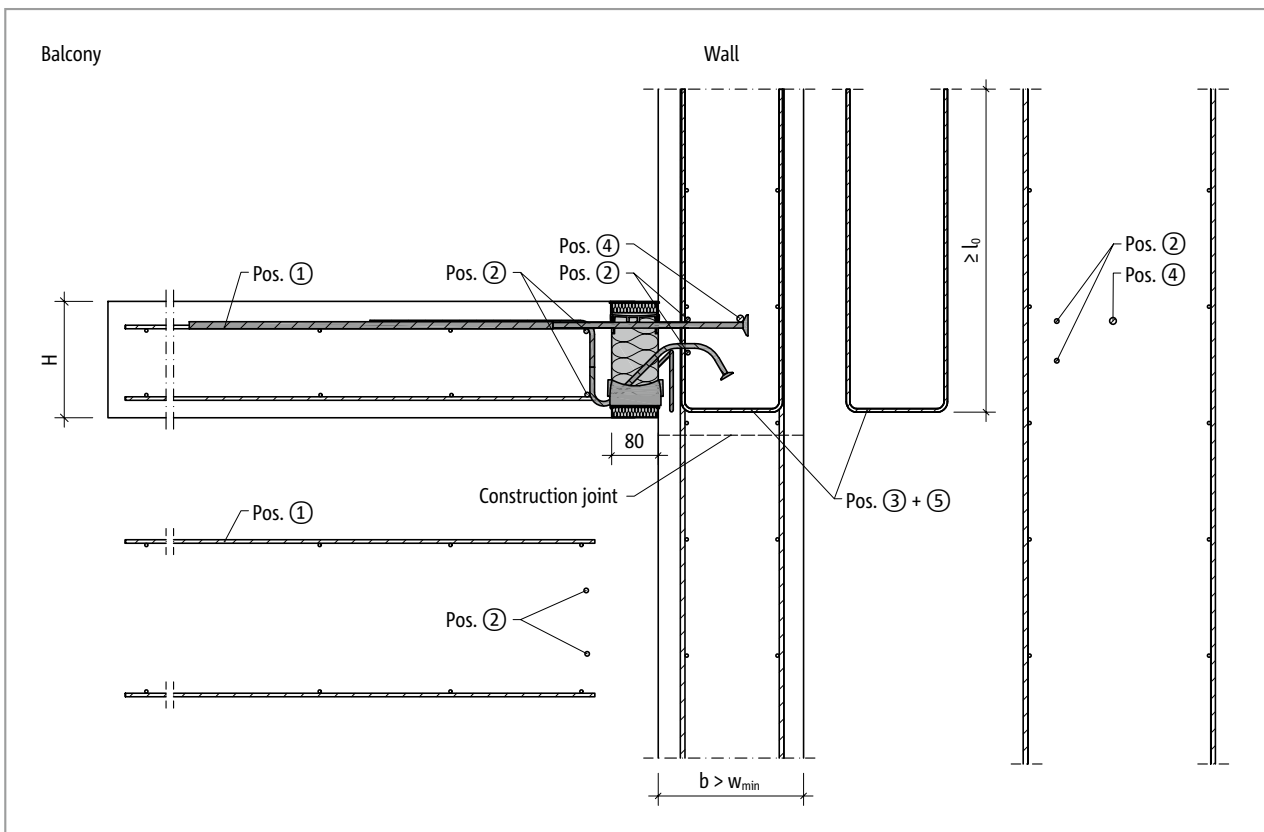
Schöck Isokorb® T type K-U: On-site reinforcement for wall connection upwards with larger structural element dimension ($w_{exist} > w_{min}$)
